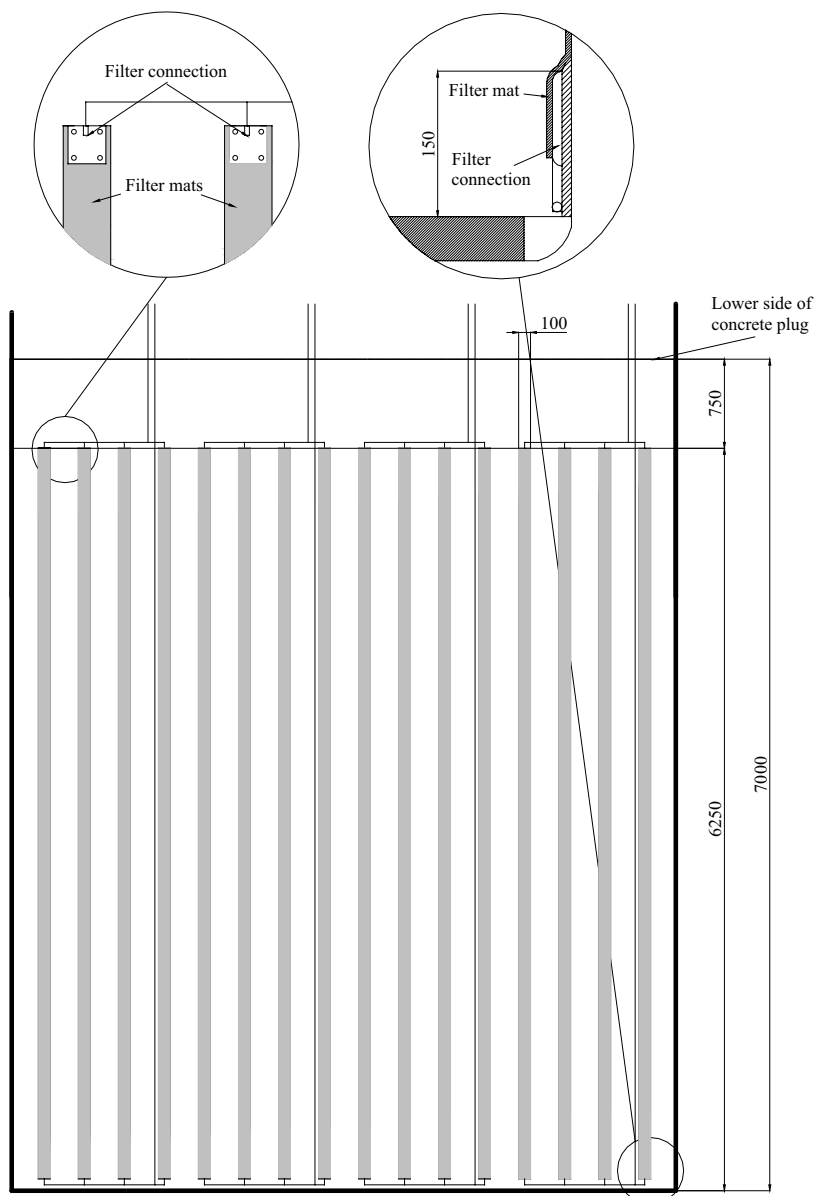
Schematic drawing of the location of the filter strips and connecting tubes in the artificial wetting system. The surface of the deposition hole has been unfolded. Dimensions indicated are given in mm.
